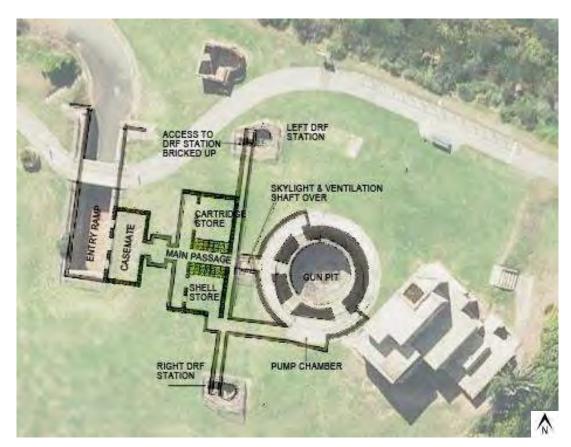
Overlaid aerial view showing the gun emplacement elements visible from ground level and the underground structures indicated in plan form. (Source: SIX Maps 2015 and Shepherds Hill Cottage and Surrounds, Conservation Study, Gardner Browne, 1984)Battery Observation Post
